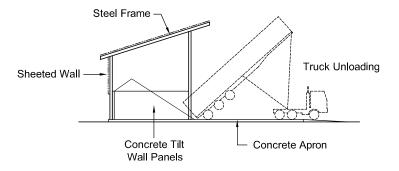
Cross section through single row open-side commodity shed (Figure 5).
